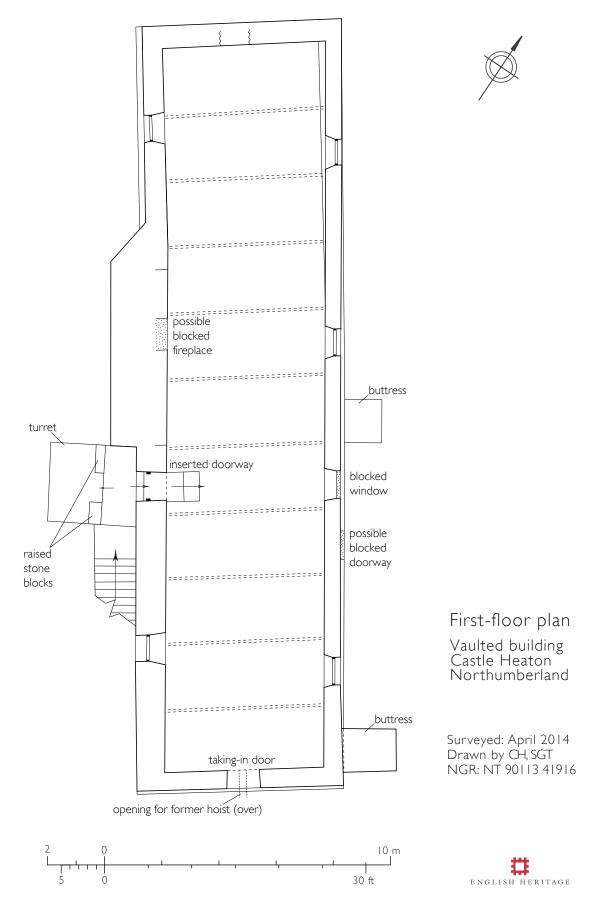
First-floor plan of the vaulted building, © English Heritage.
